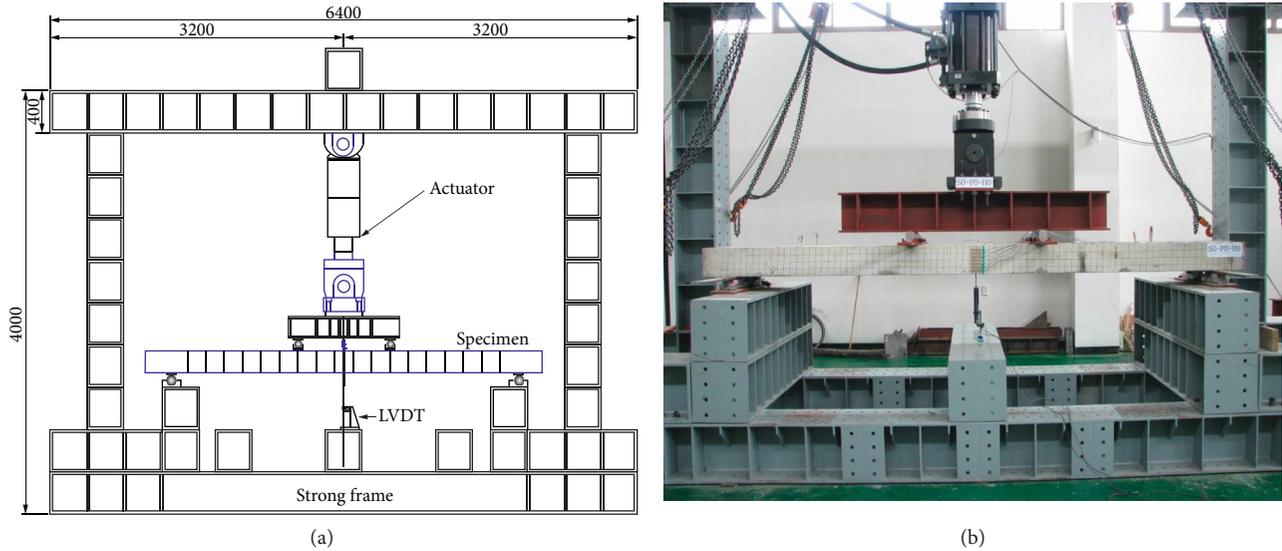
Test setting of the voided slab. (a) Flexural test setup diagram (unit: mm). (b) Test setting and loading configuration.
